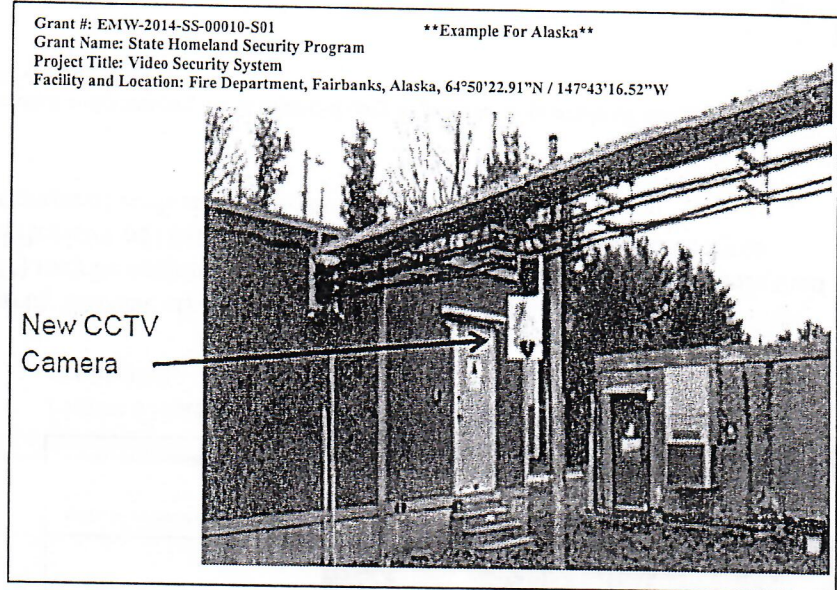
Ground-level photograph with graphic showing proposed equipment installation.
